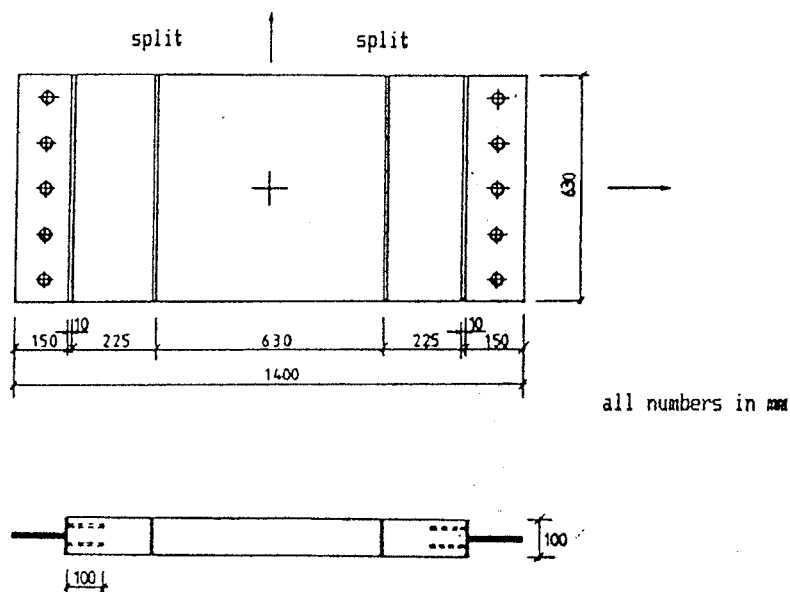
Test principle and dimensions of the concrete specimens
